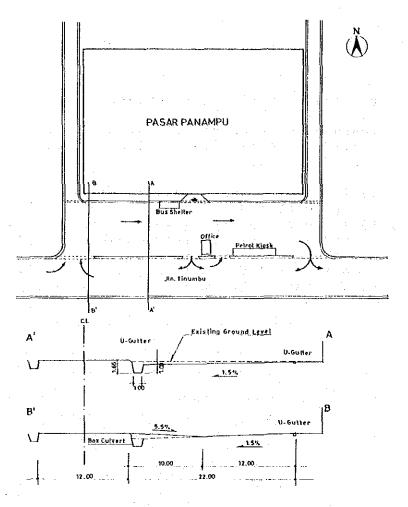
Panampu Sub-Terminal Improvement Plan
